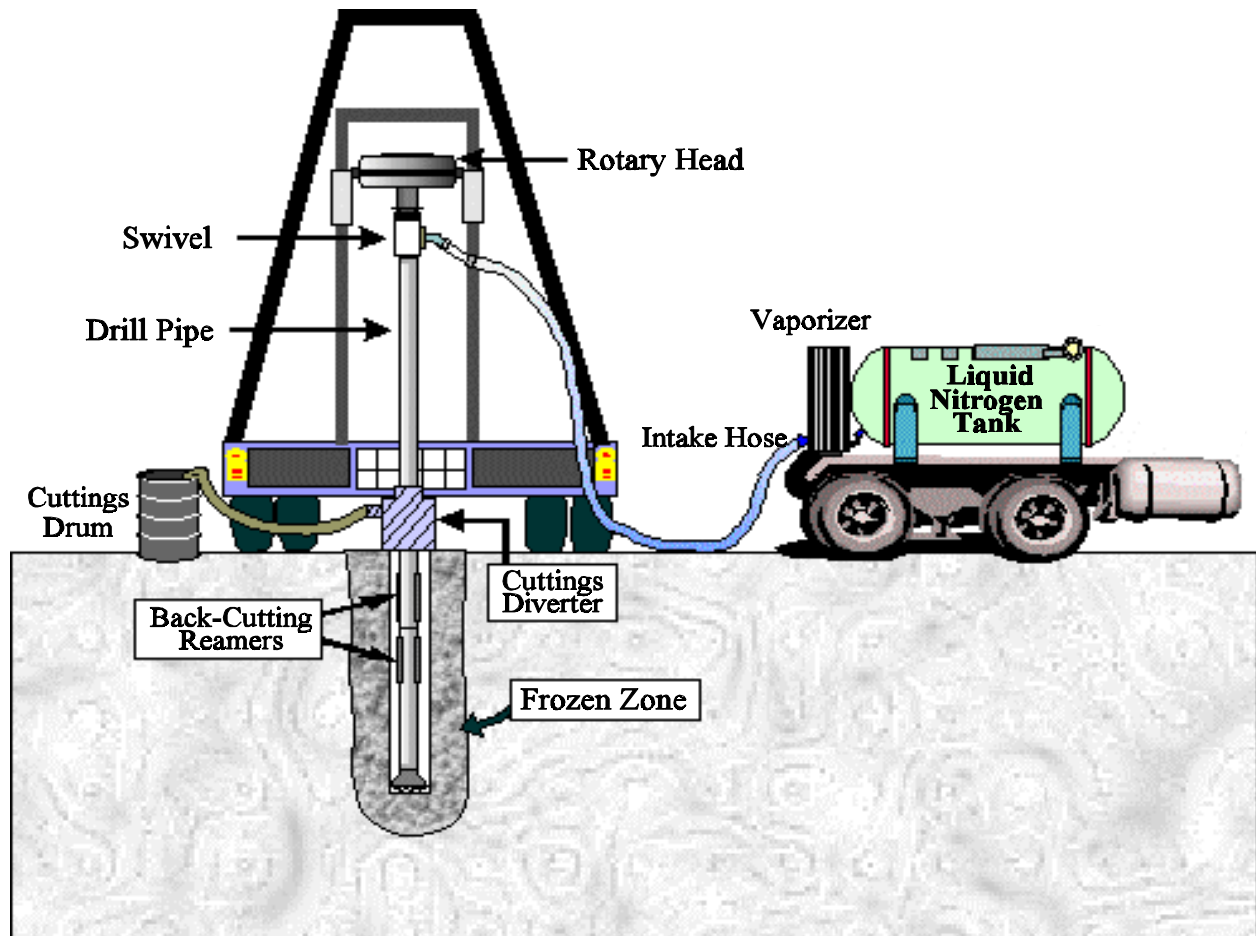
Liquid nitrogen tanker with vaporizer unit attached to the completed drilling assembly.
